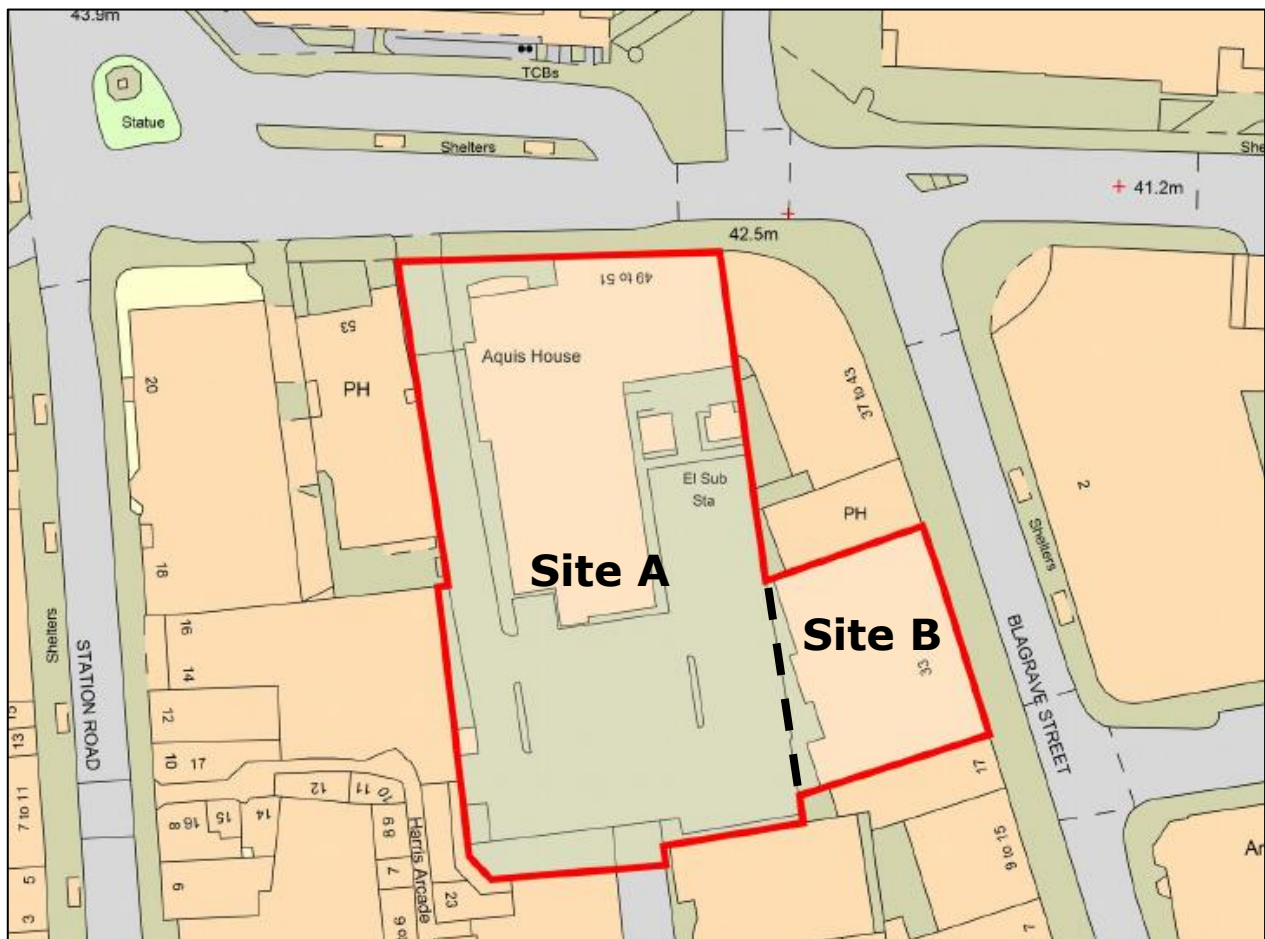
Site Location Plan. The plan demonstrates how the site can be split into Site A and Site B. Source: Promap.
